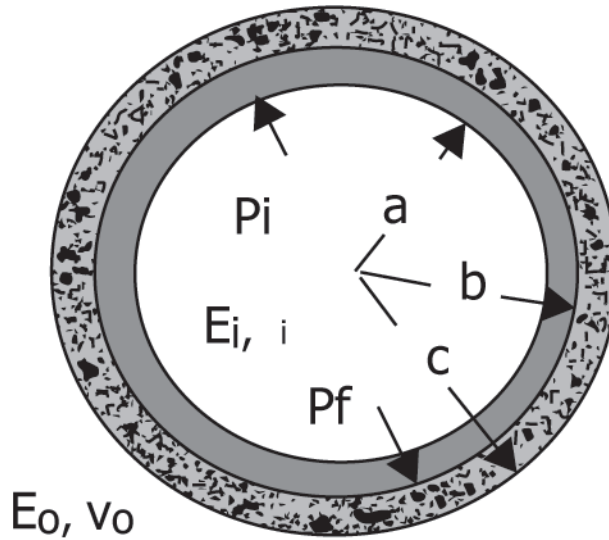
Dual Wall Composite Pipe – Pipe: Compressed-Fit
